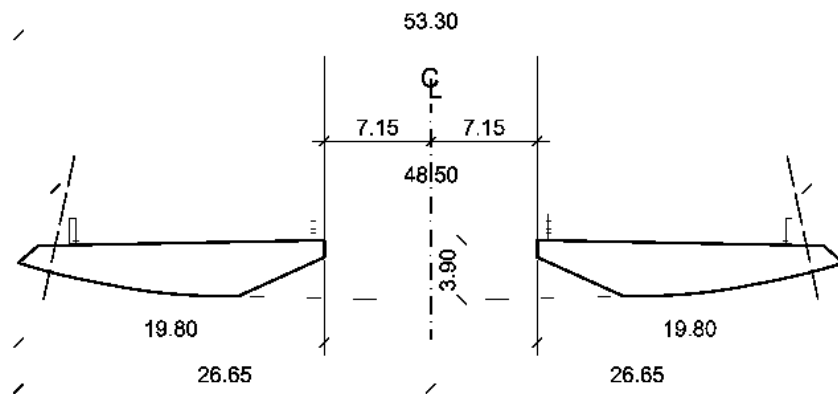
Cross section of the Stonecutters Bridge in Hong Kong, China.
